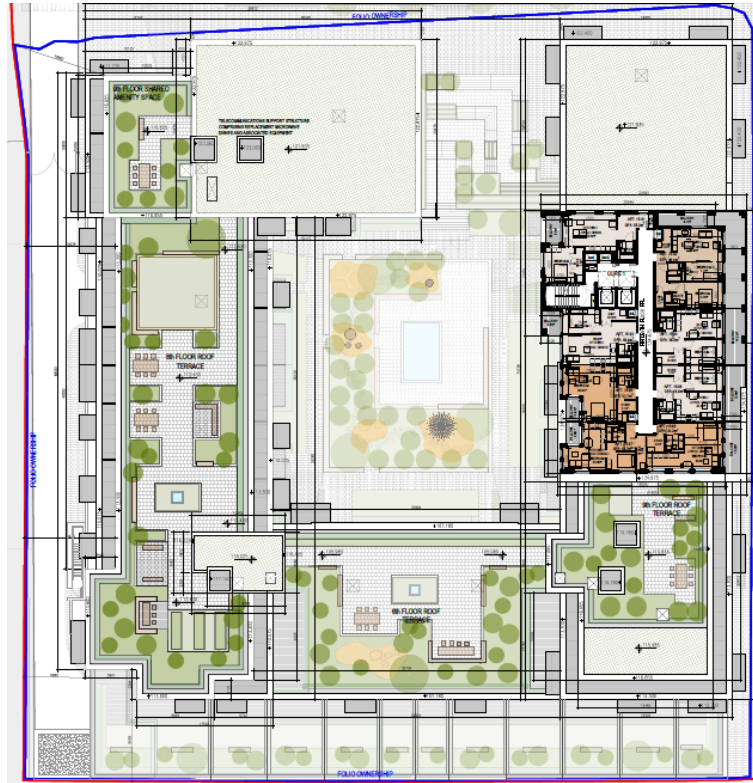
Fifteenth floor plan. 3 no. one-bedroom apartments and 5 no. two-bedroom apartments are provided at this level.
